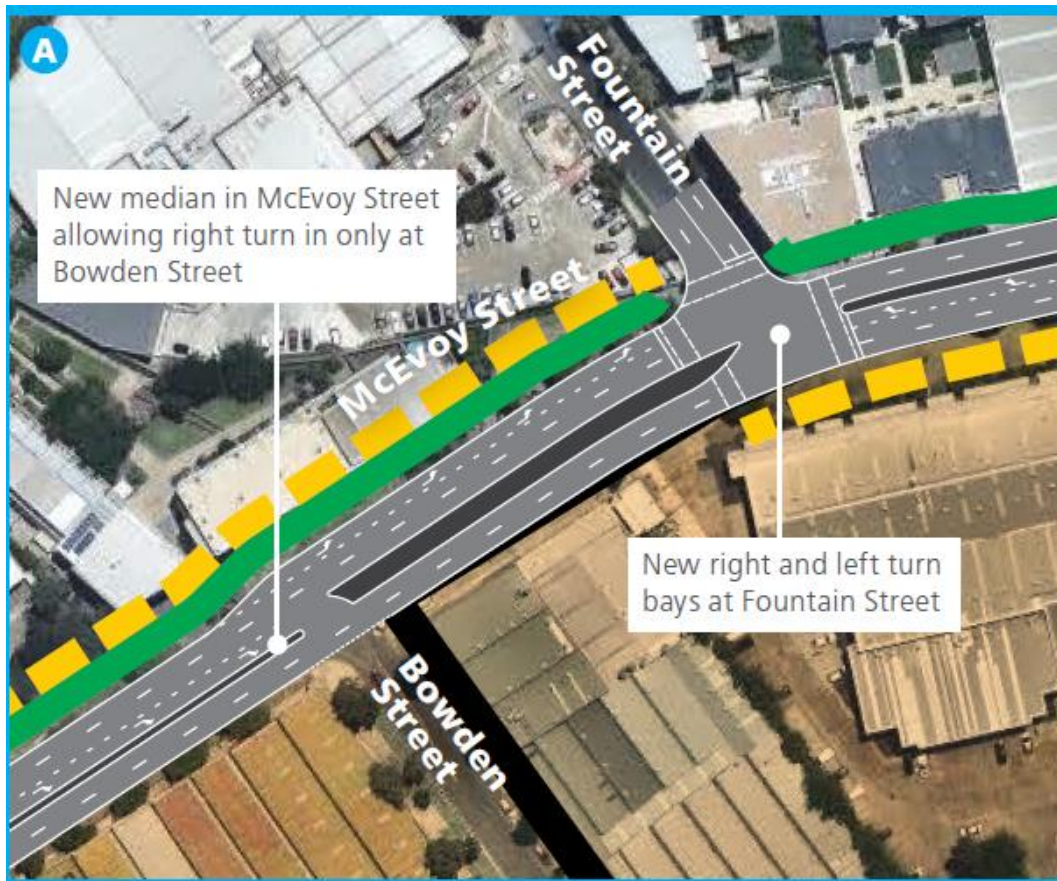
McEvoy Street and Fountain Street intersection upgrade
